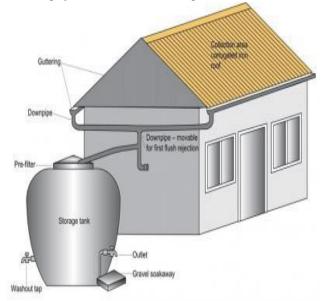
Rainwater Harvesting System with Roof Catchment Connecting Pipes and Storage Tank^[8].
